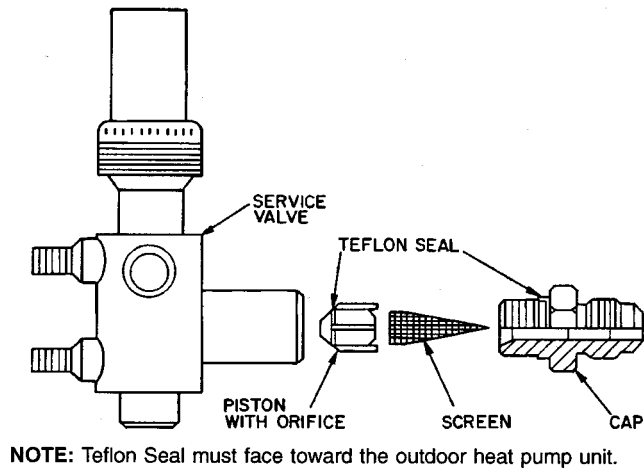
AccuRater Metering Device at Service Valve (Bypass Type Components)
